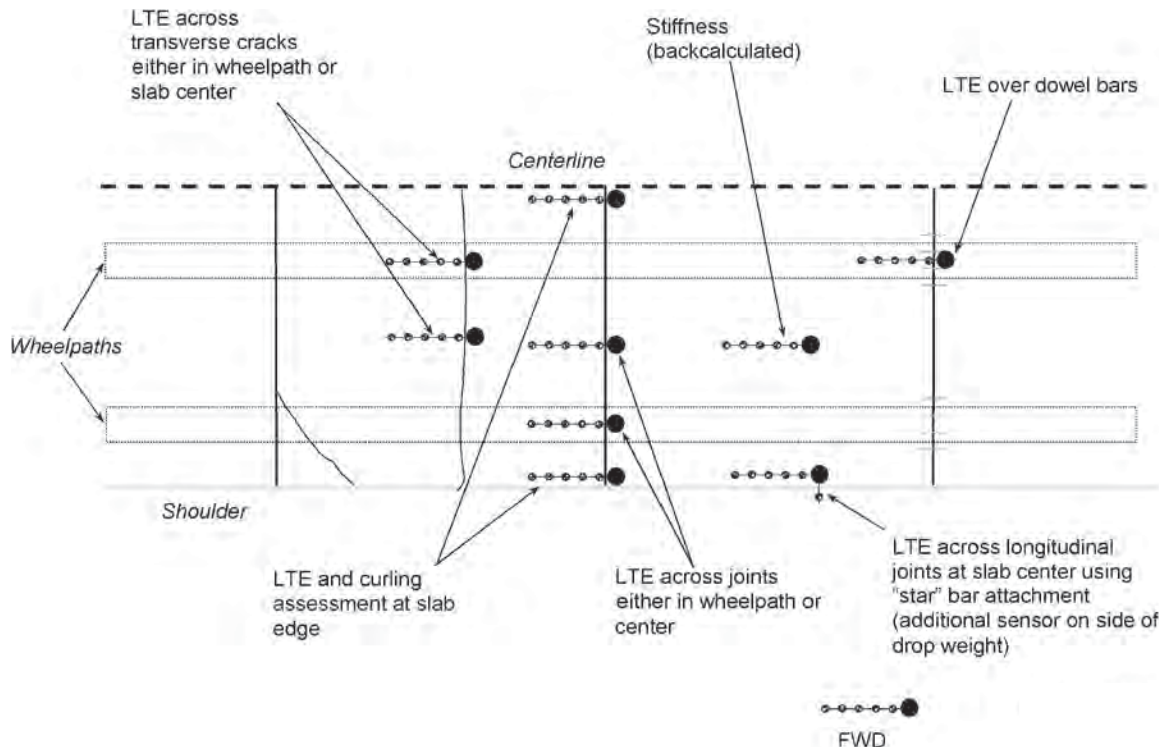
Example FWD test locations on jointed plain concrete pavements.
